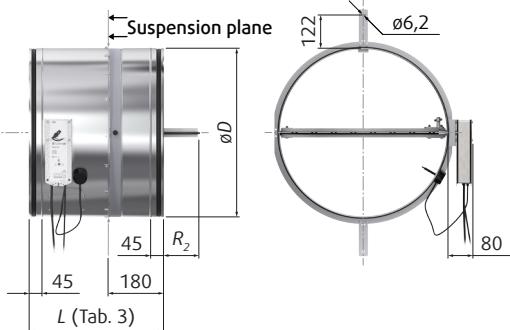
Dimensions of the servomotor controlled circular fire damper PKIR
